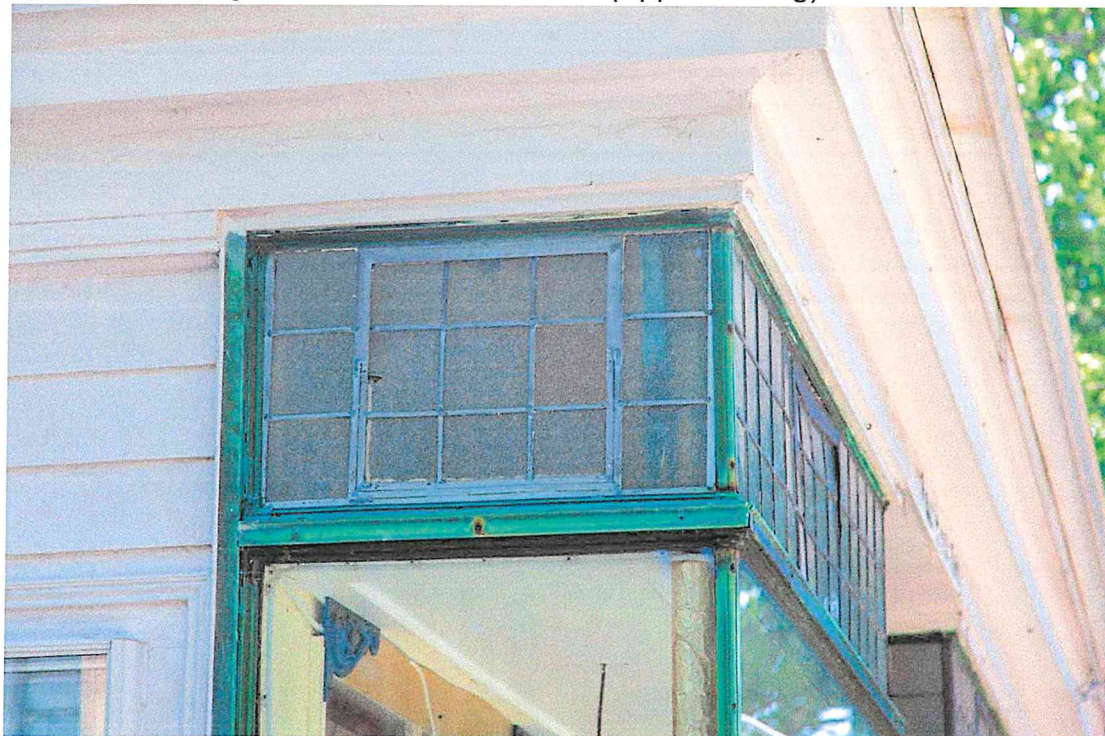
Existing Storefront to be Removed (Upper Glazing and Door Transoms)
